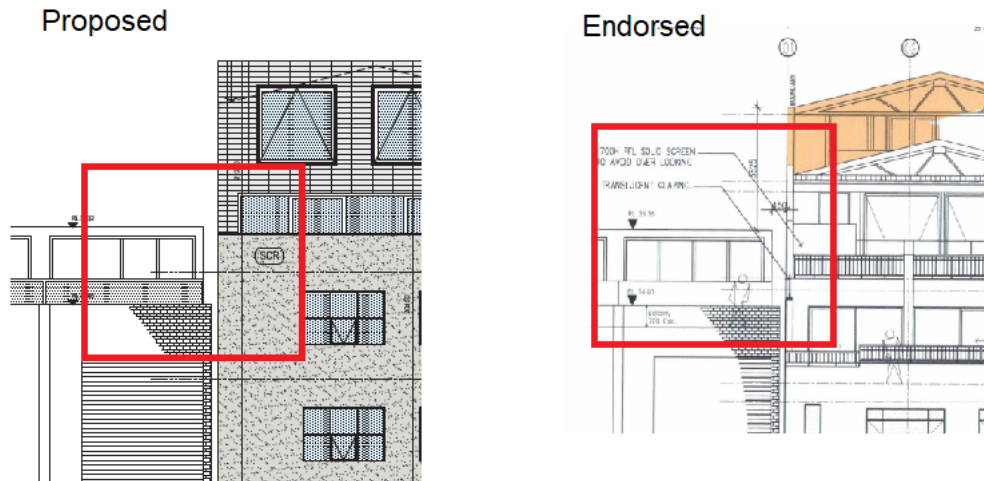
Southern elevation comparing the screen of endorsed plans to the replacement walls adjacent the balcony of the western adjoining dwelling.
